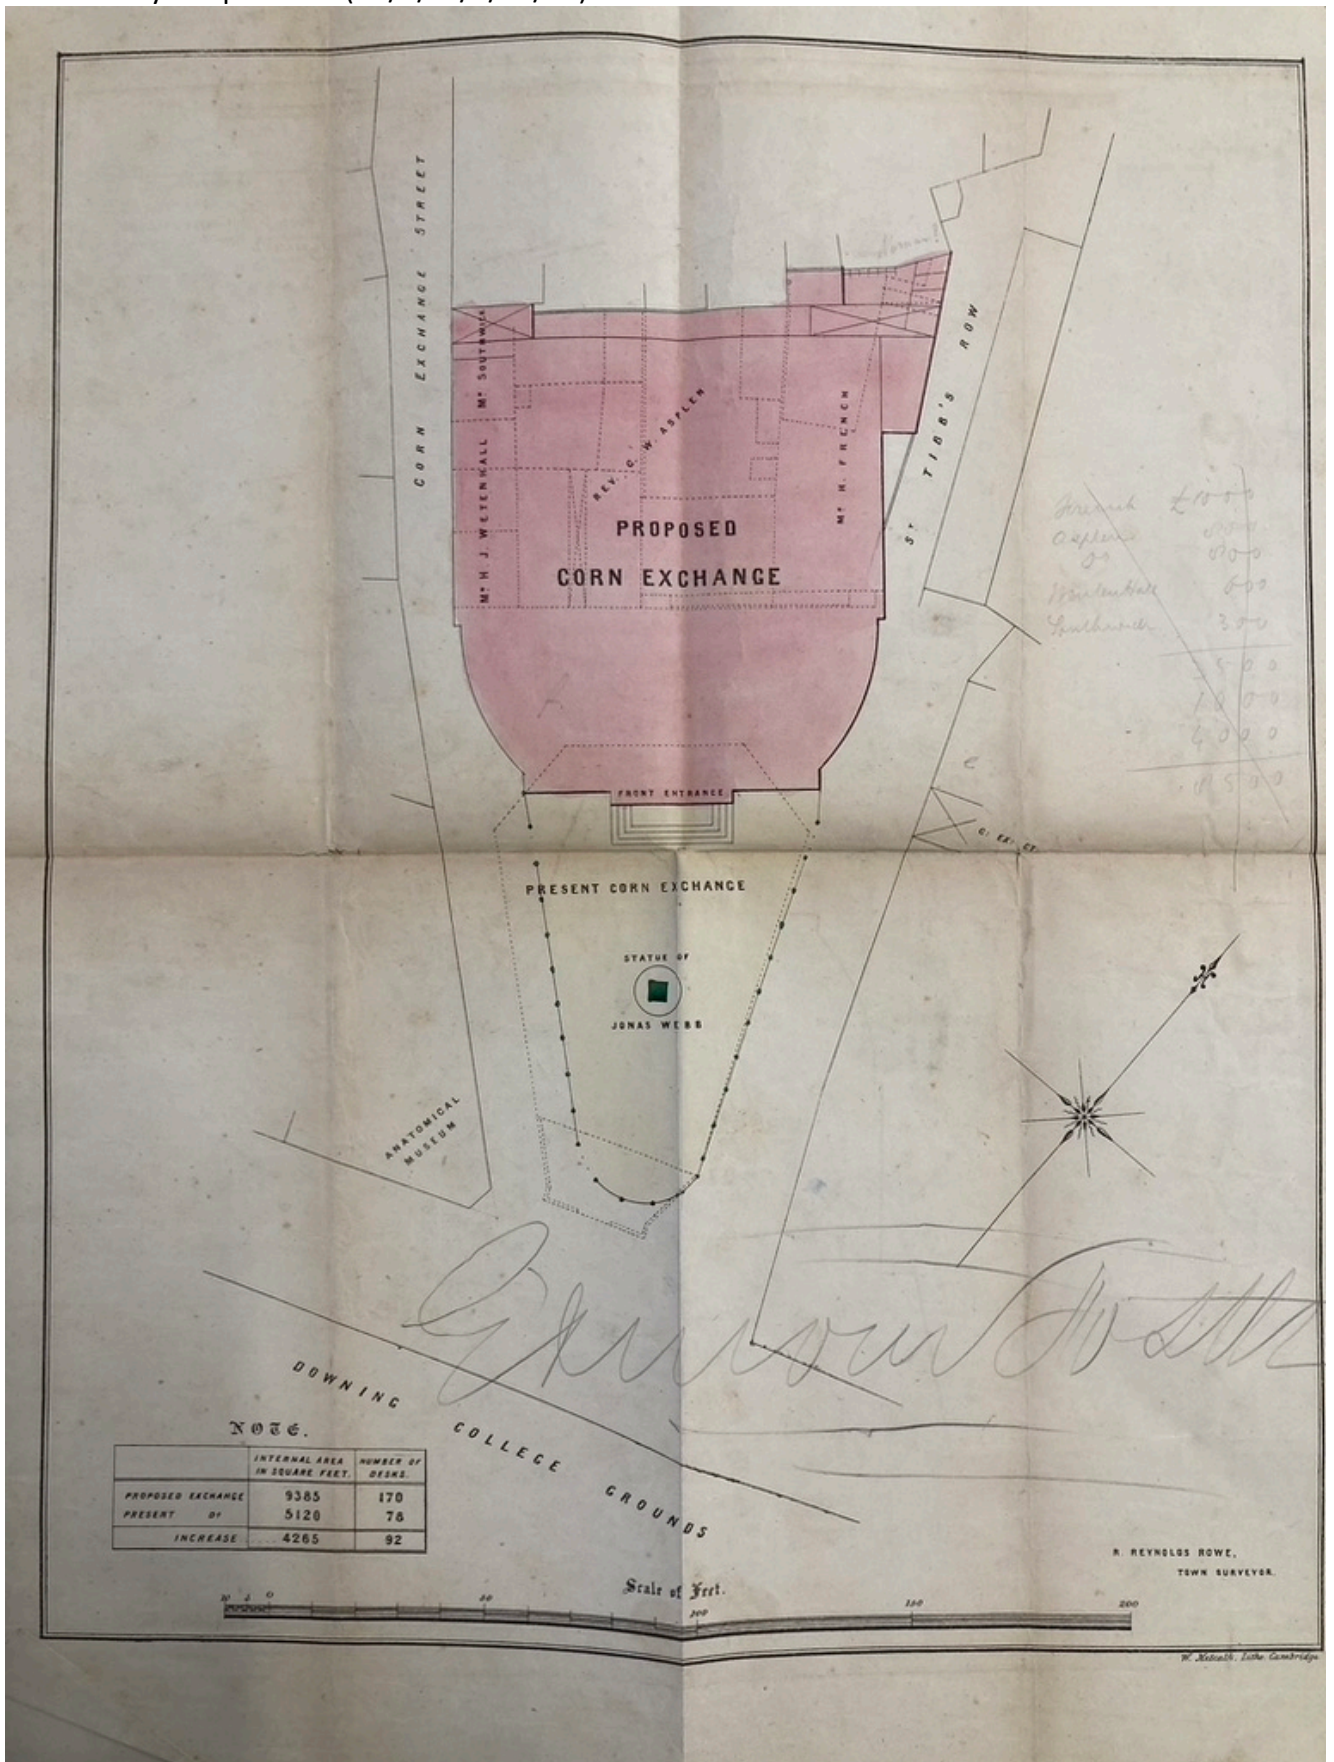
St Andrew's Hill site. Plan of proposed site for New Corn Exchange by R Reynolds Rowe, town surveyor. April 1869 (CB/2/CL/7/40/60)
